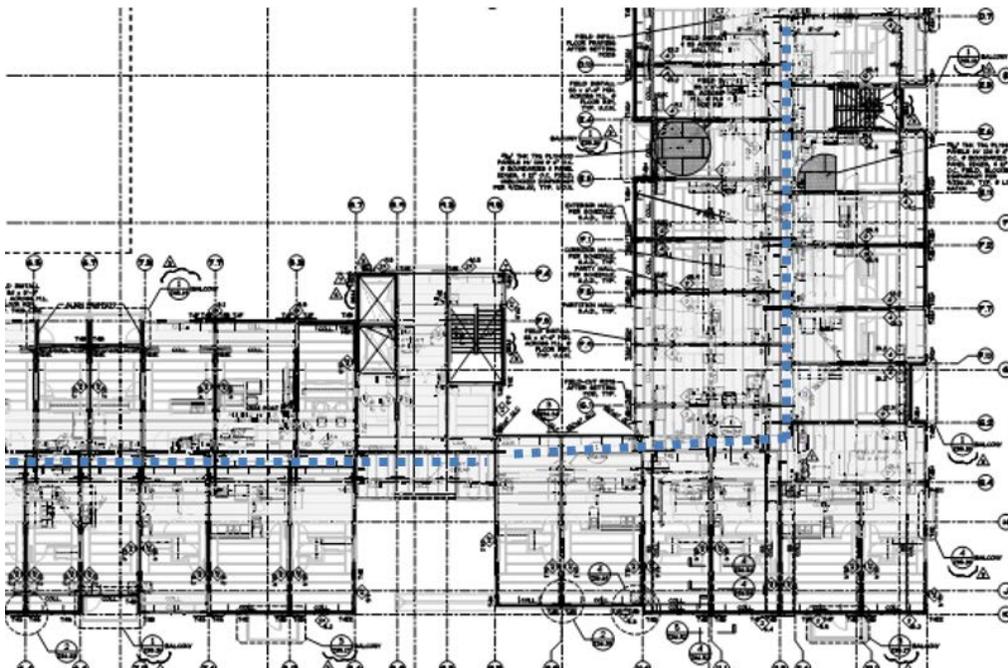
Case Study #1: Partial floor plan (dotted line shows common center hallway)
